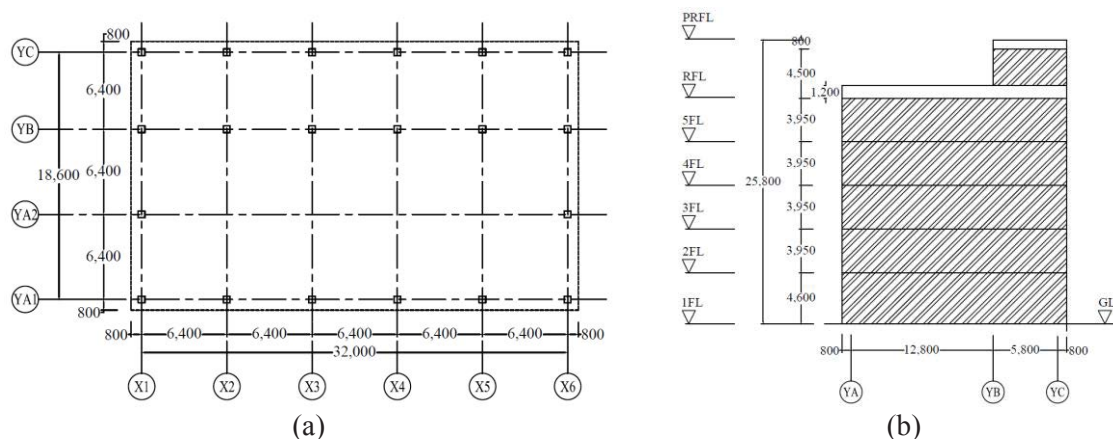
(a) Plan view of the building; and (b) side view of the building.
